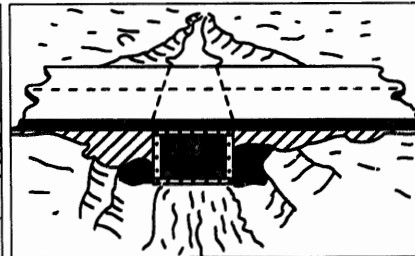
A load-bearing box culvert. Note: On some DMA products, large load-bearing box culverts are treated as bridges.
